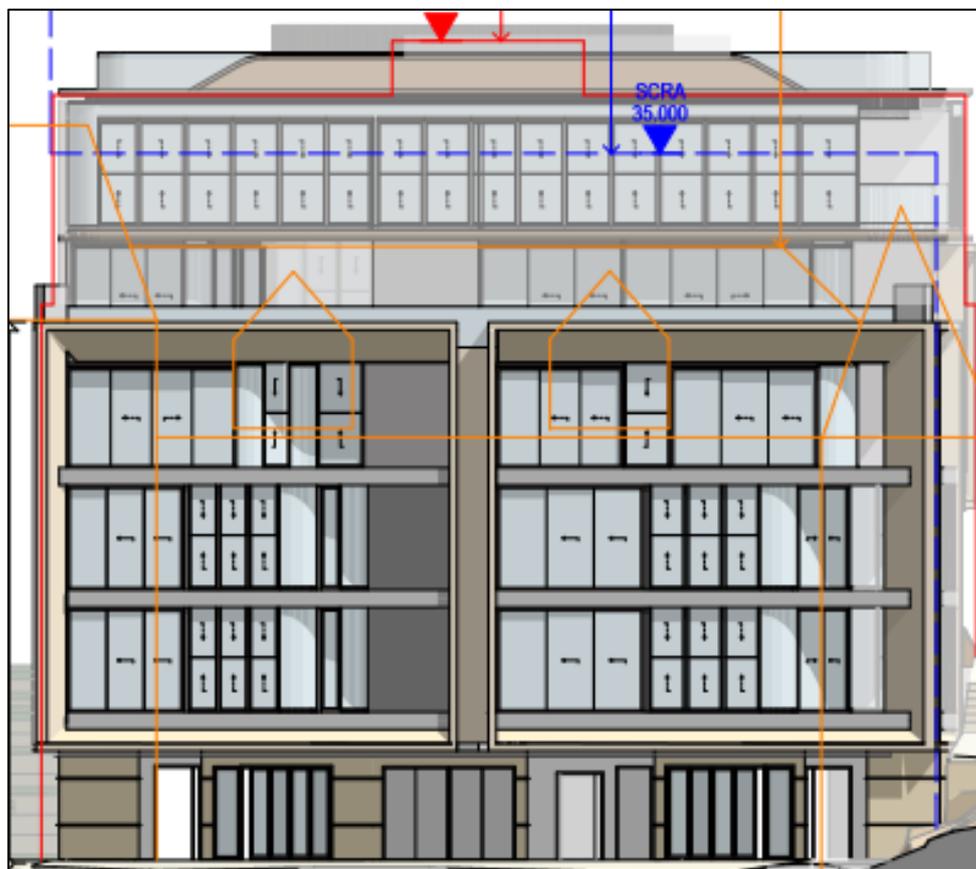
Eastern (Harrington Street) elevation of Building 2 (Source: Architectural Plans)
